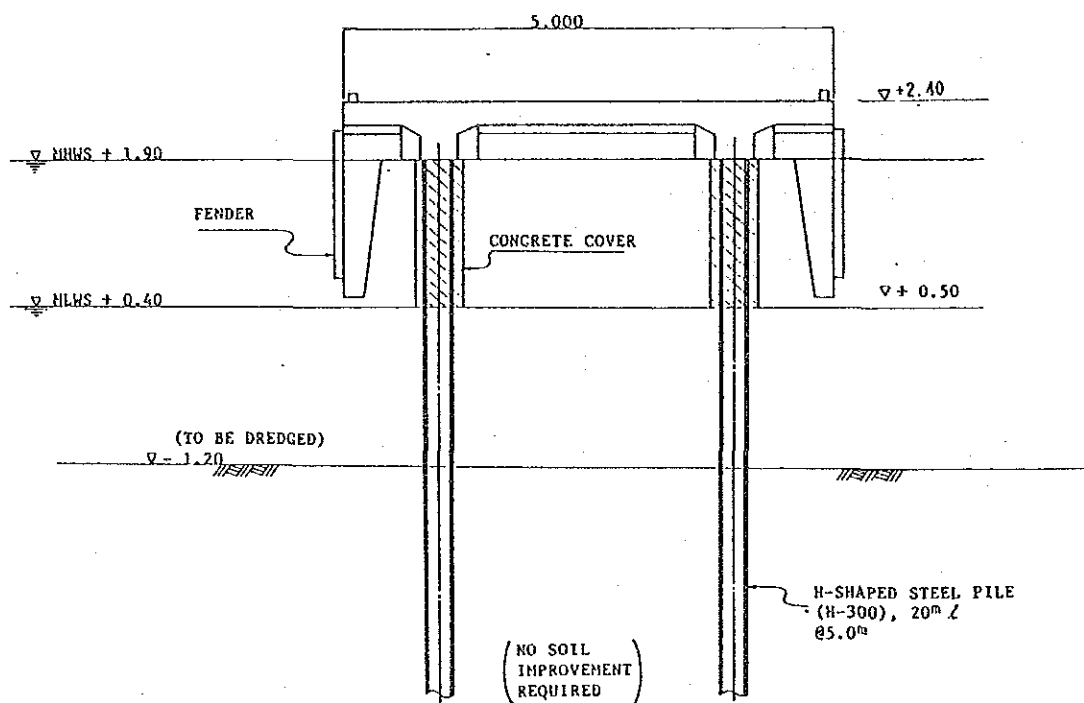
, TYPICAL SECTION OF FINGER JETTY
